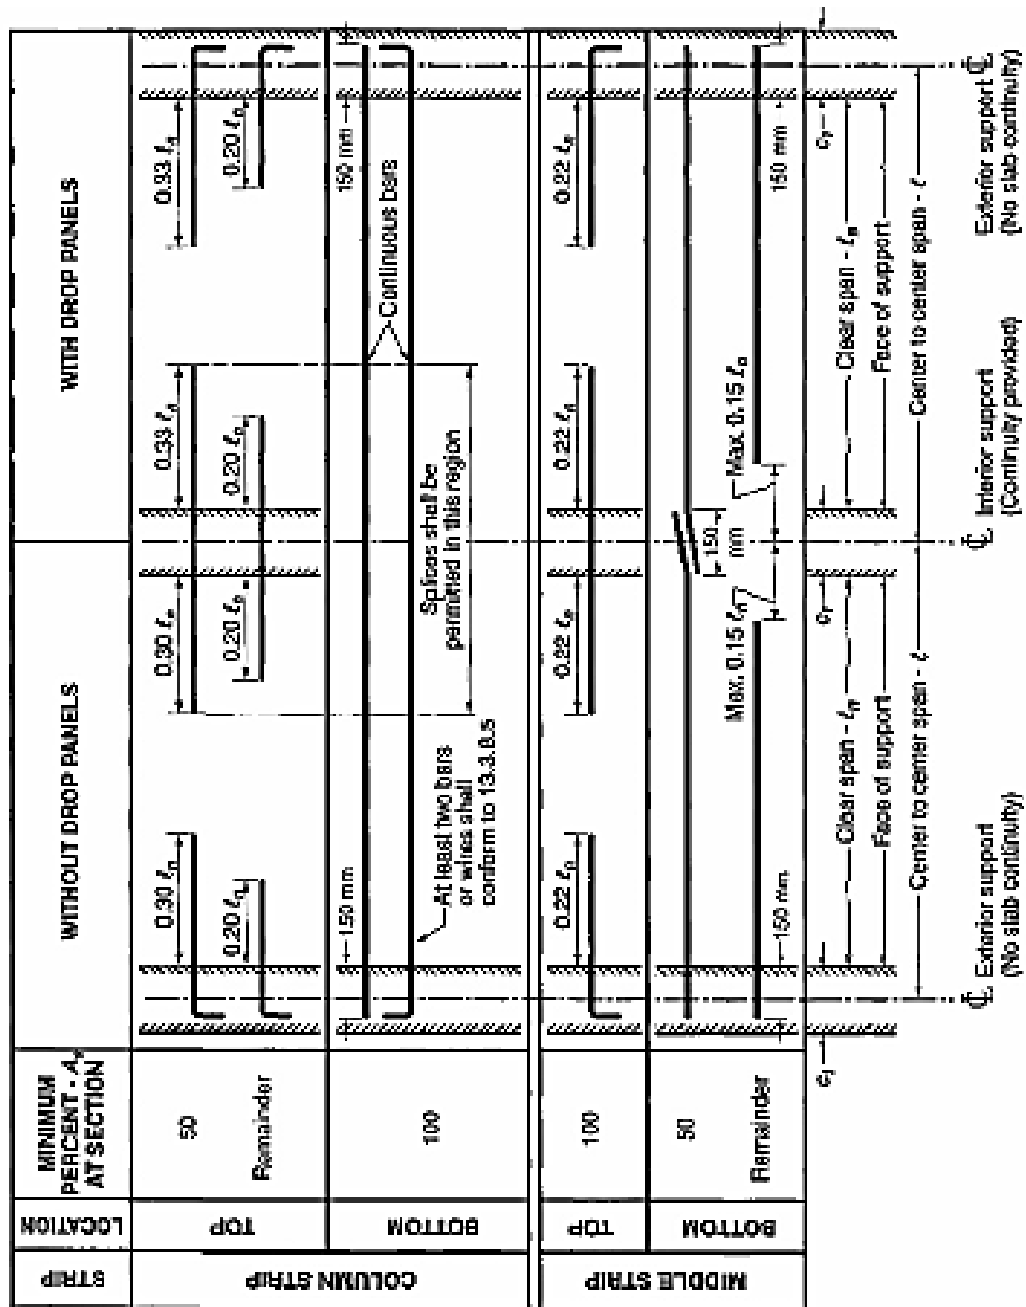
Minimum extensions for reinforcement in slabs without beams. (See 12.11.1 for reinforcement extension into supports)
